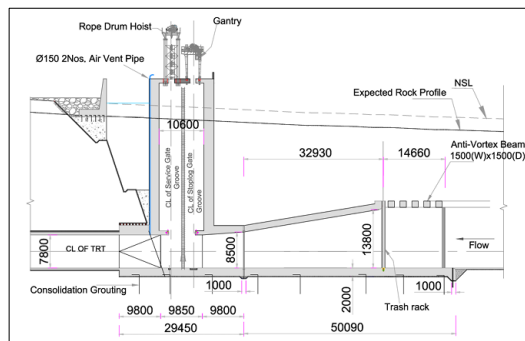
Typical longitudinal section of Diffuser type intake structure in pumped storage project
